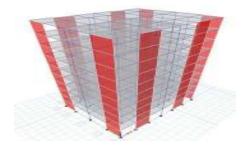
D Modeling of Building with 1.5% shear wall ratio
